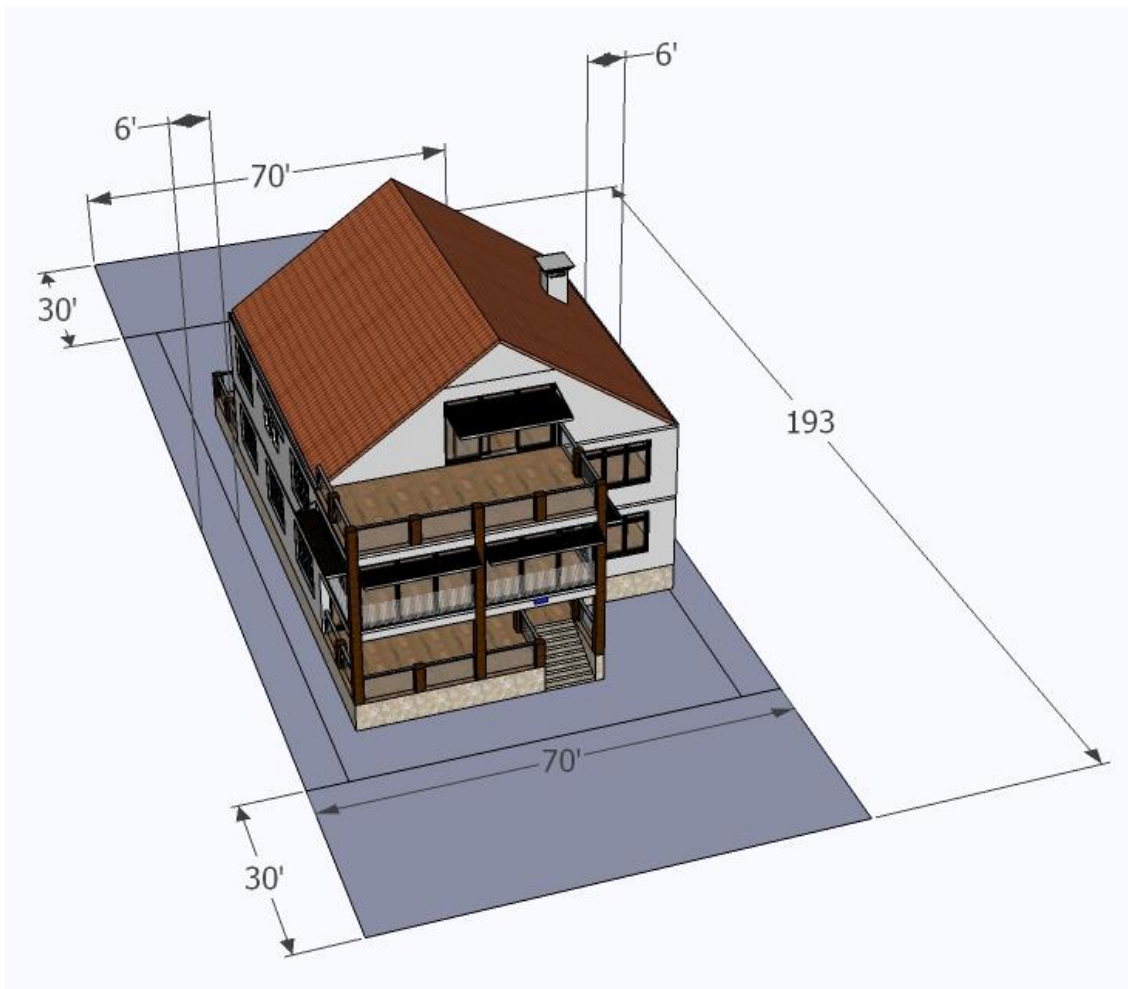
Illustration of R-3 Minimum Lot Standards (3-unit Building Shown)
